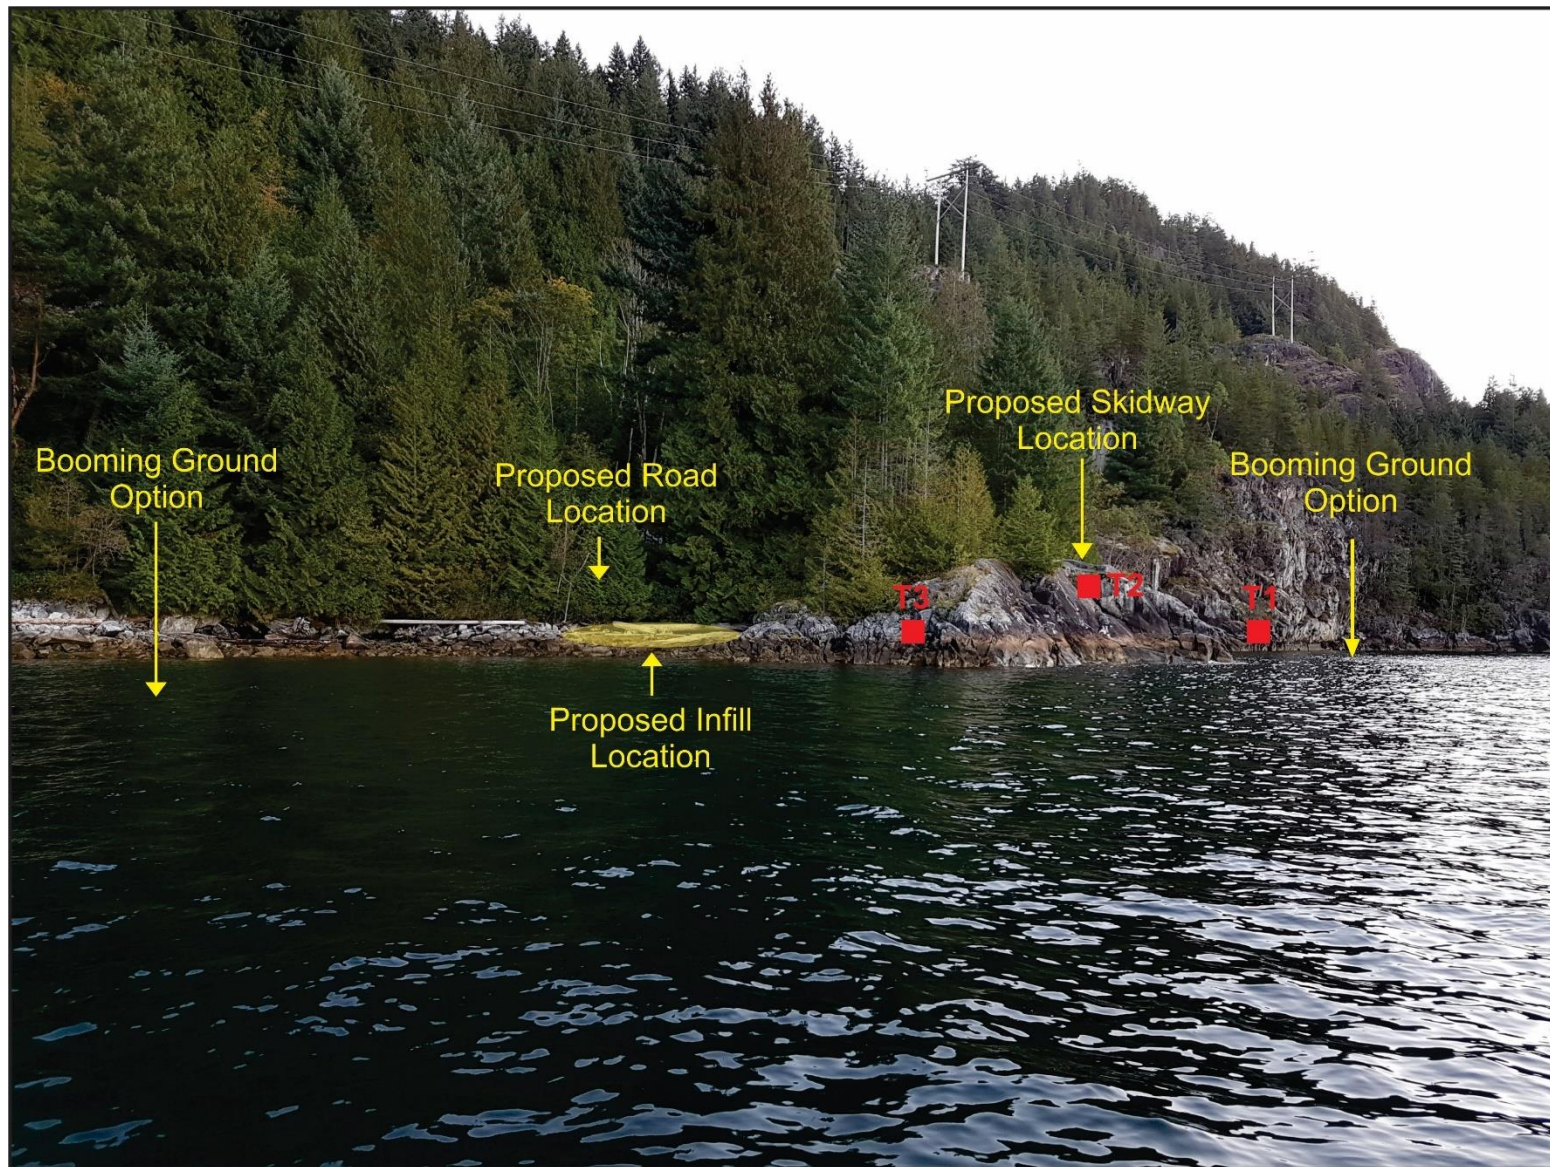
Overview of facility features at the proposed Bailey Bay Log Watering Facility. Photo taken October 5th, 2017.
